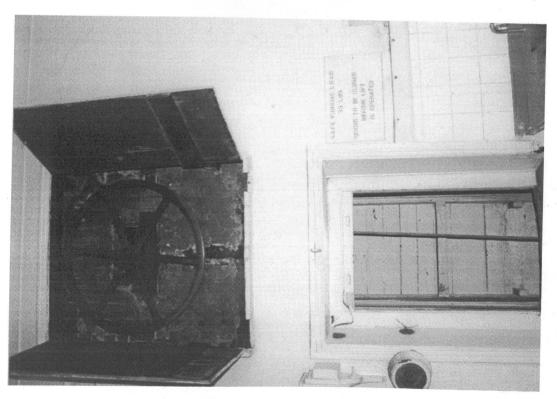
Dumb-waiter in situ, First Floor, Building 6
